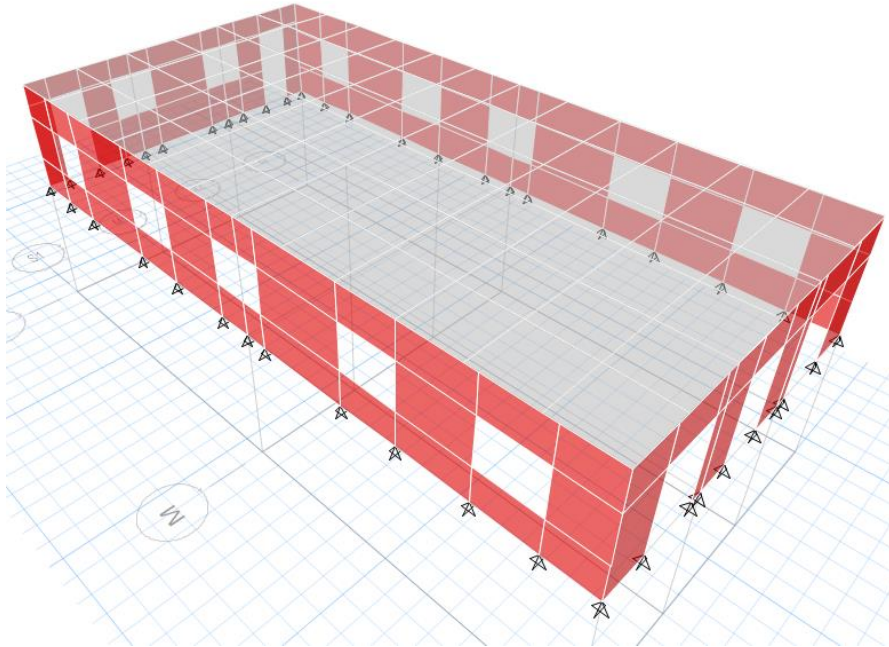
3D ETABS model of example one-story URM building used to study out-of-plane behavior of URM walls.
